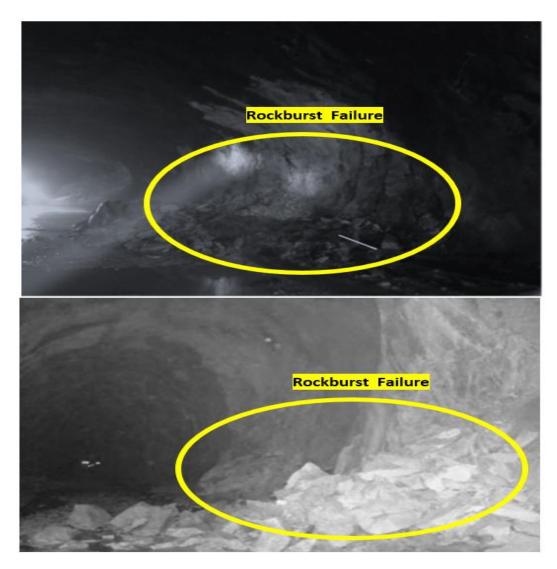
Rockburst failure in deep underground excavations
